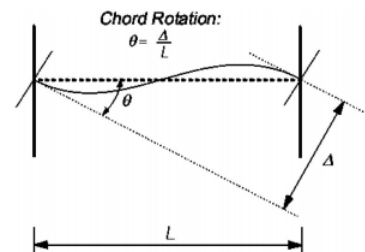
Chord Rotation for Structural Wall Coupling Beams
